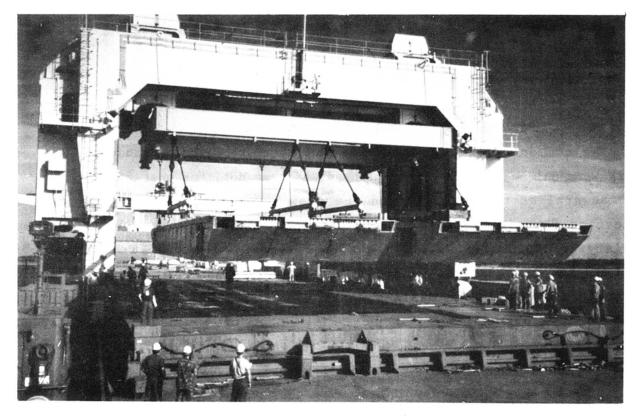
Gantry Crane Transporting Two ELCAS Pierhead Sections (Lift 1)
